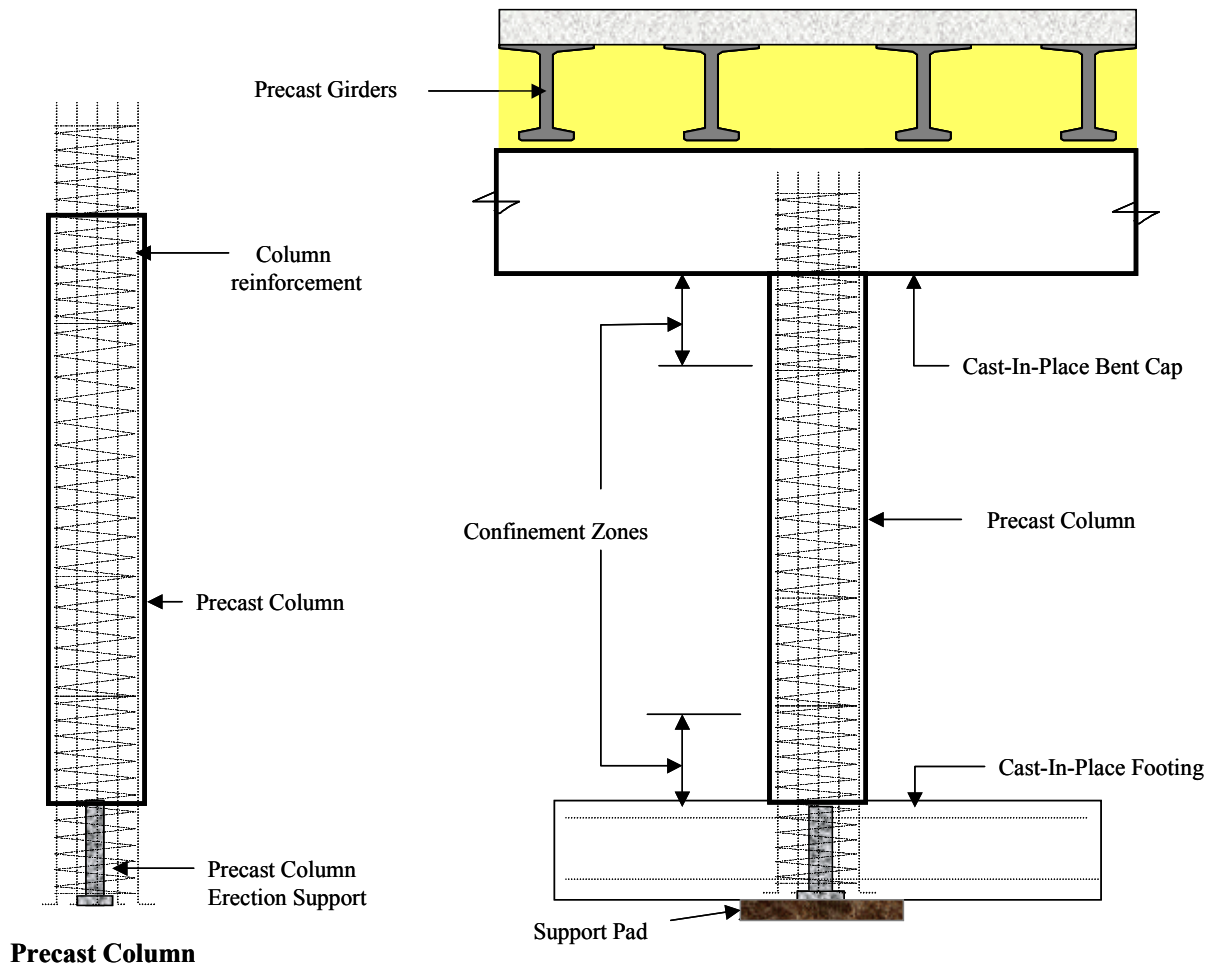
Precast Columns on Spread Footing for a Prestressed Girder Bridge
